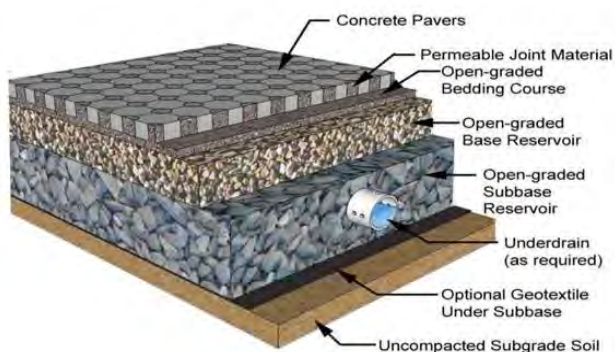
Schematic diagram of permeable pavement. Source: CSTpavers.com
